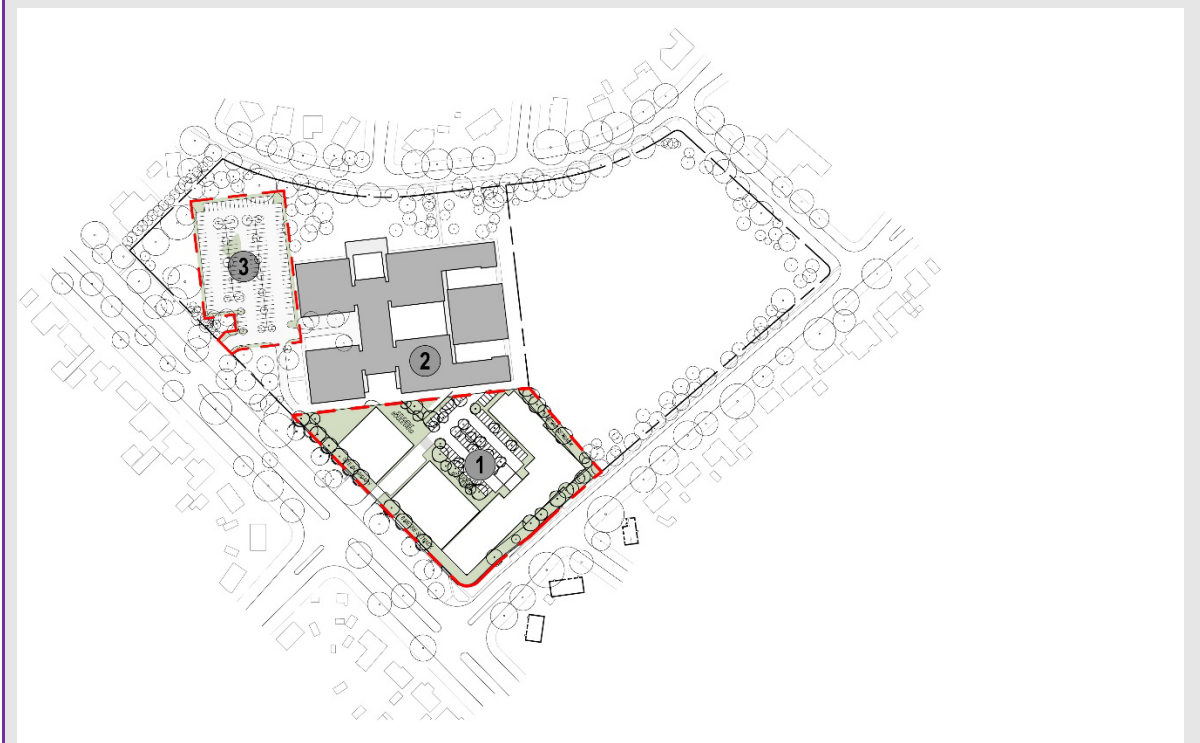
Figure F: AIE Campus Masterplan STAGE 1, Block 4 - Section 13 Watson
